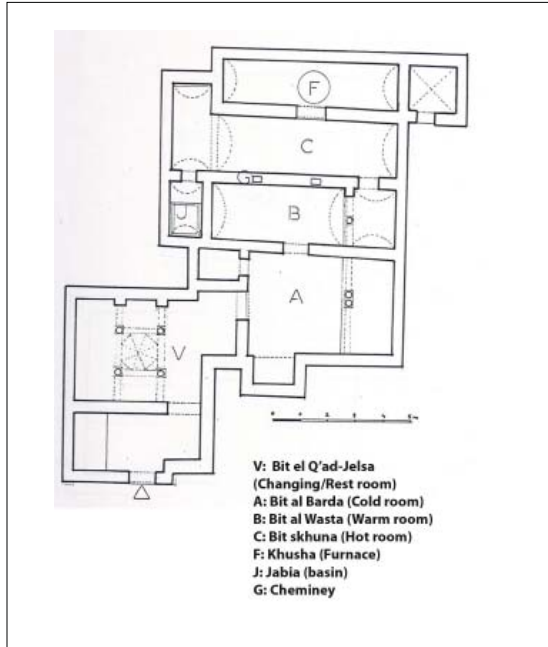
Plan of hammam Sidi Bû Madyan (Moussaoui, 1990).
